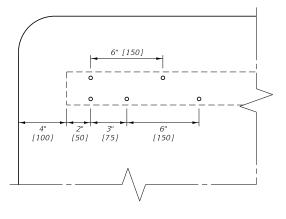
DETAILED DRAWING REFERENCE DWG. NO. STANDARD SPEC. SECTION 556,619,704 619-16
